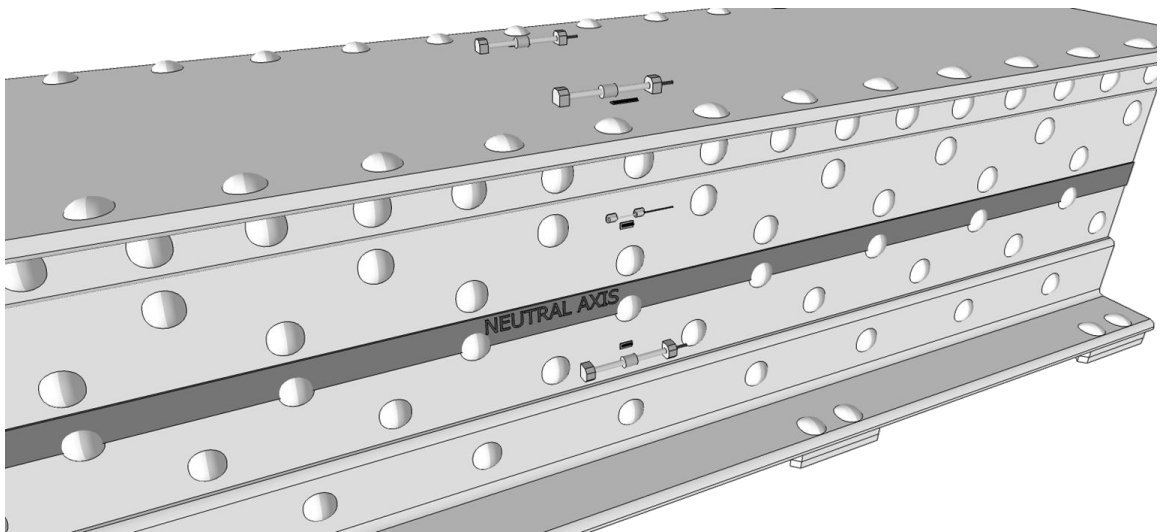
Detailed 3D SketchUp Model Developed for an Instrumentation Plan
